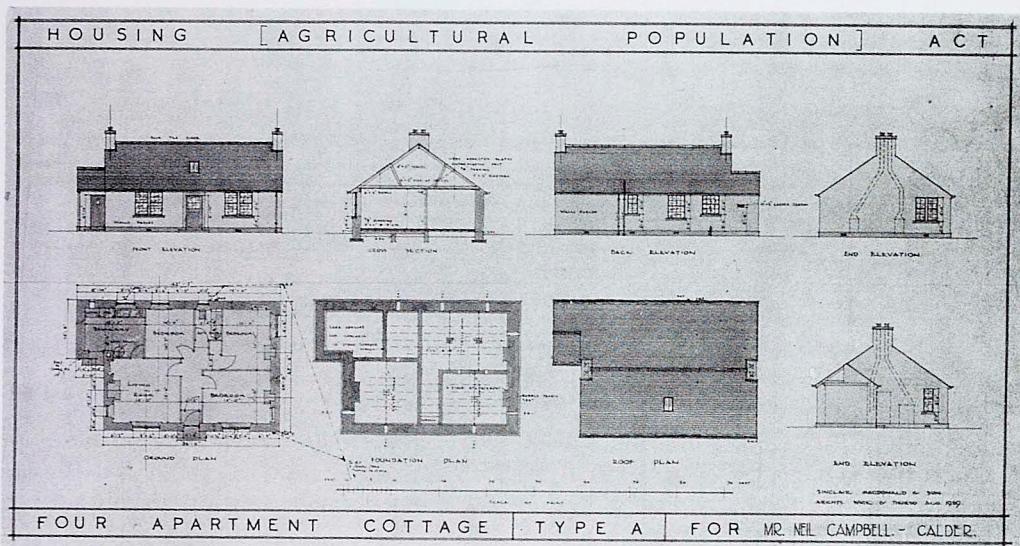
Old Calder, Highland. Foundation, floor and roof plans, sections and elevations of four-apartment cottage type 'A' showing reconstruction under the Housing (Agricultural Population) Act, for Mr Neil Campbell, c. 1939. Sinclair MacDonald and Son Collection, located at the North Highland Archive, Wick (Crown Copyright: RCAHMS) SC773891.
